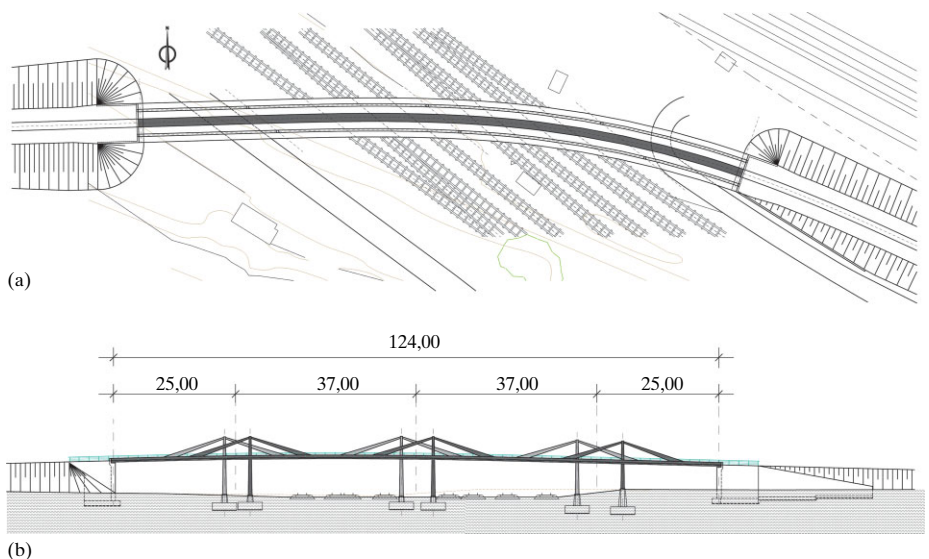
Salto del Carnero railway bridge a) Plan view b) Elevation
